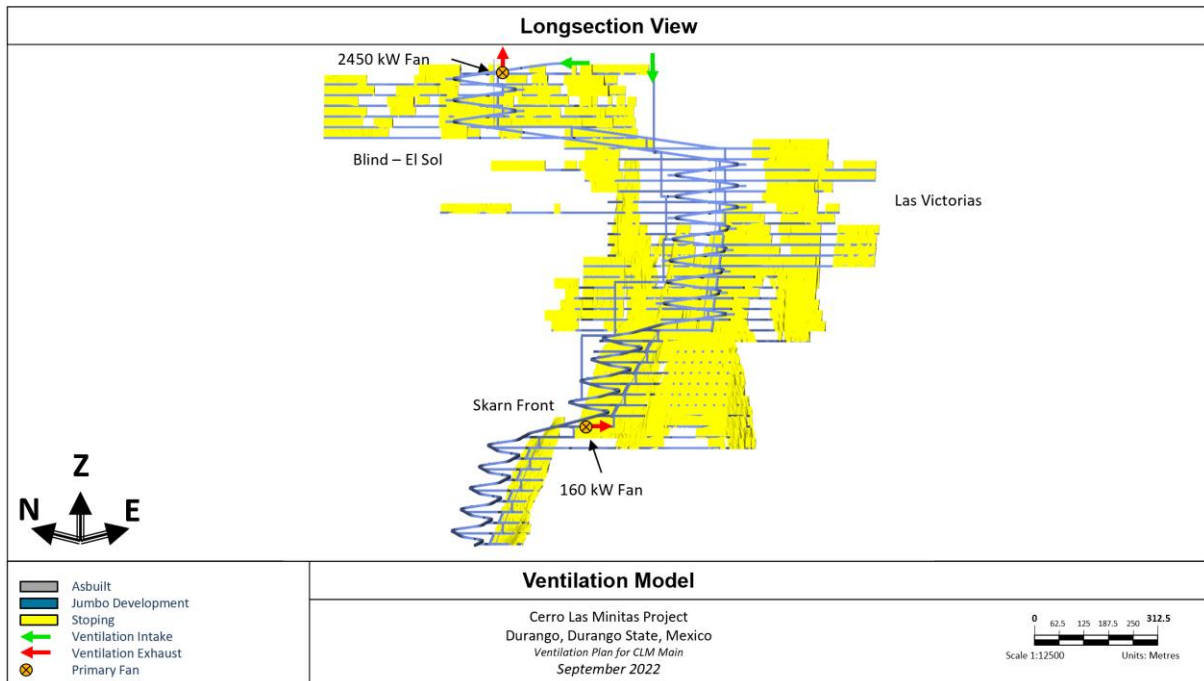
Primary Ventilation Layout of Cerro Las Minitas - Main
